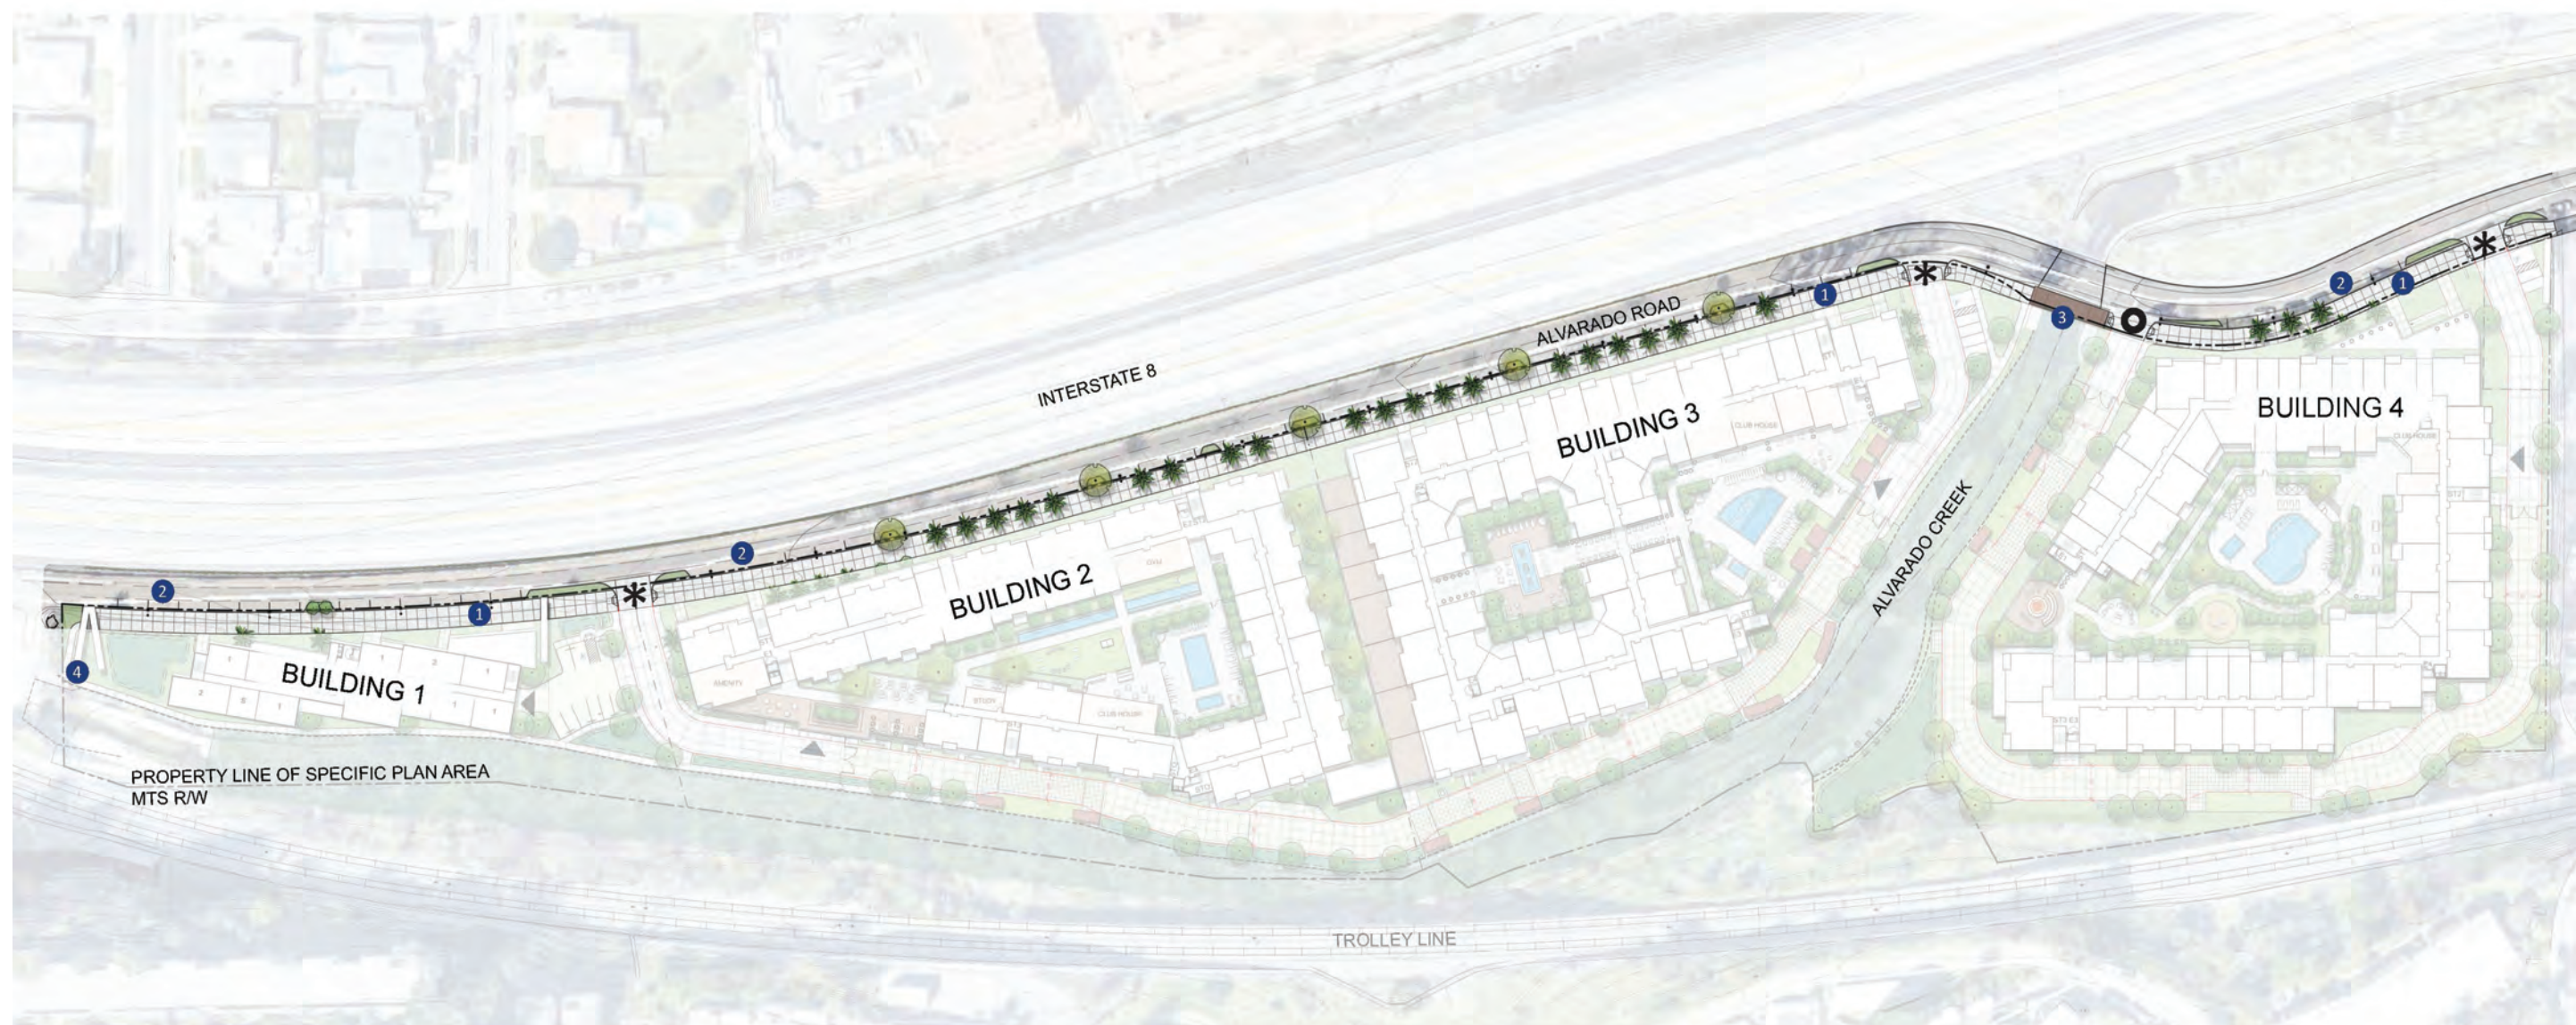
Alvarado Road Streetscape Improvement Plan View Details
